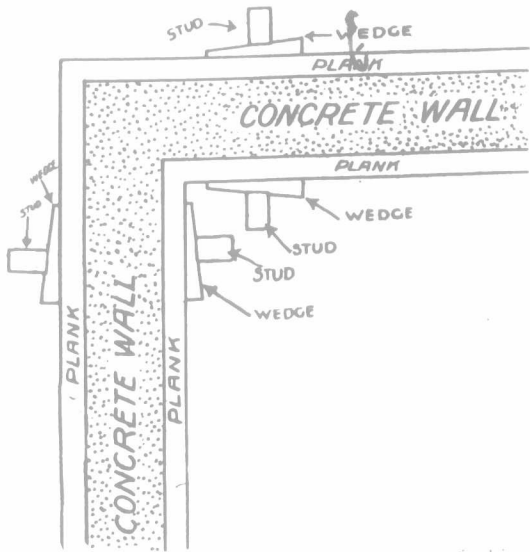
Corner Concrete Wall. Showing planking and supports. Two hovel wedges at each stud, one at top, other at bottom of plank.
